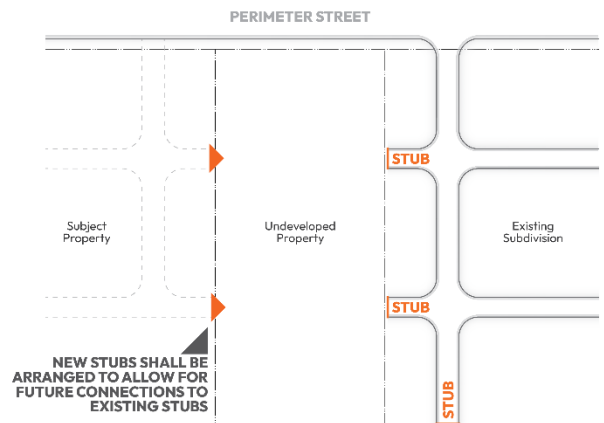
Roadway Stub Location and Arrangement - Nearby Property Stub
